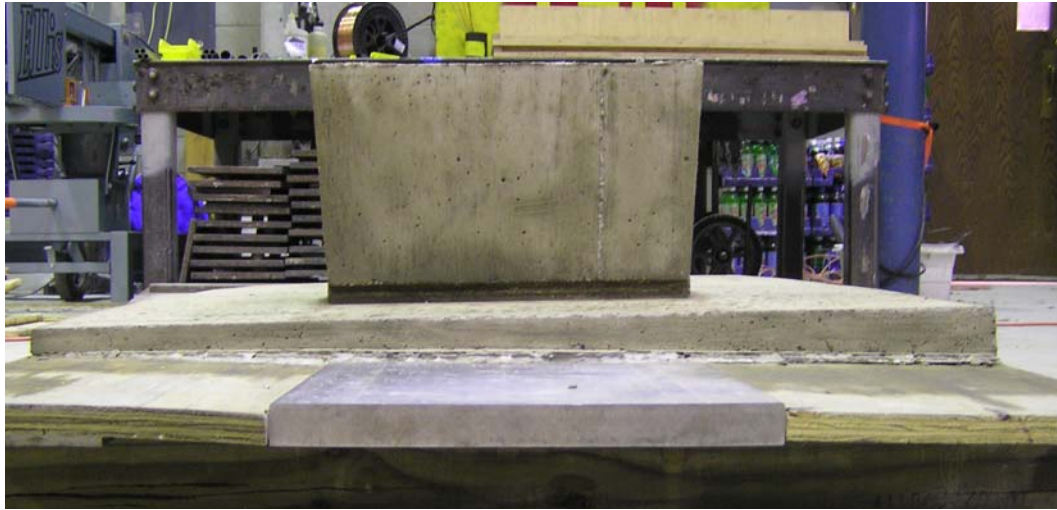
Concrete Consolidation in Haunch and Shear Stud Pocket
